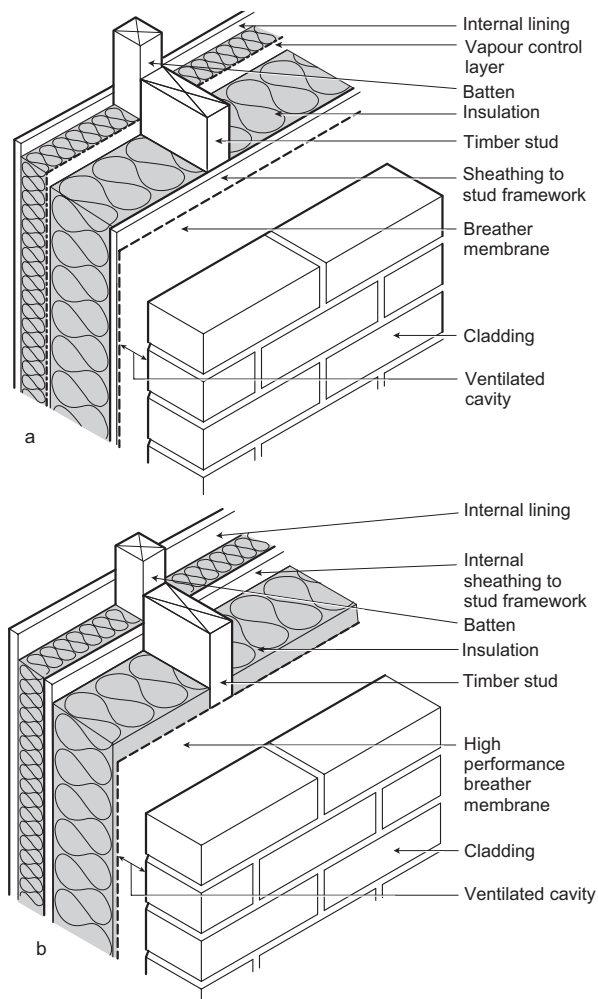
Typical wall construction with insulated service zone on inside face containing additional insulation:
